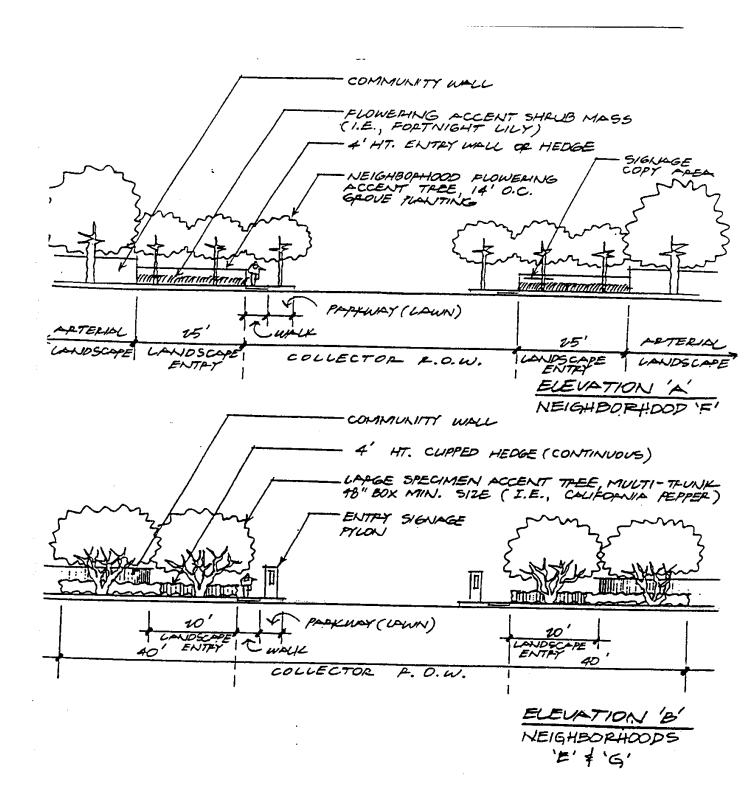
CENTRAL MOUNTAIN HOUSE LANDSCAPE CONCEPT
